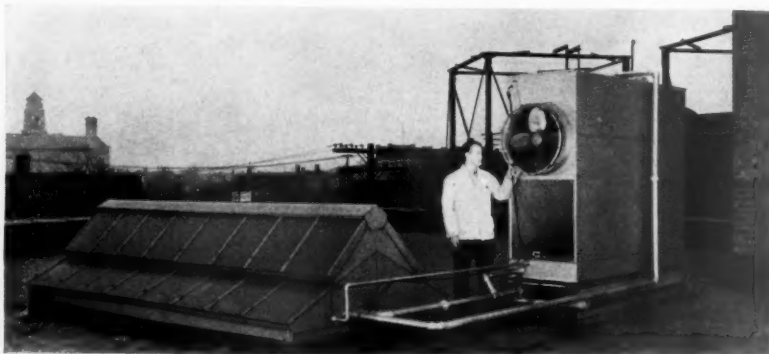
Forced draft water cooling tower on roof of A. G. A. Testing Laboratories building
